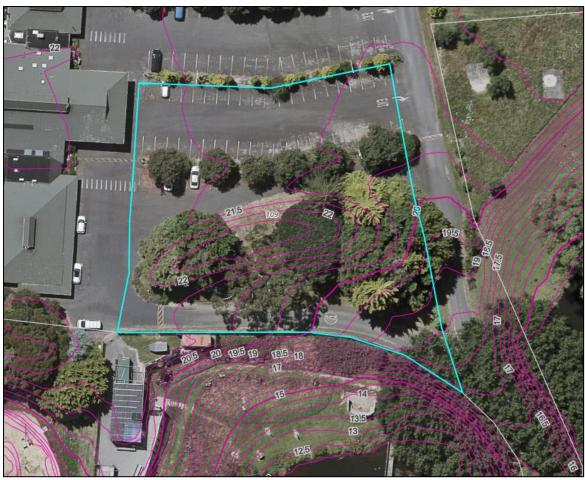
Aerial image with pink contour lines denoting the topography of the application site noting earthworks have been undertaken within this area for the construction of the townhouses
